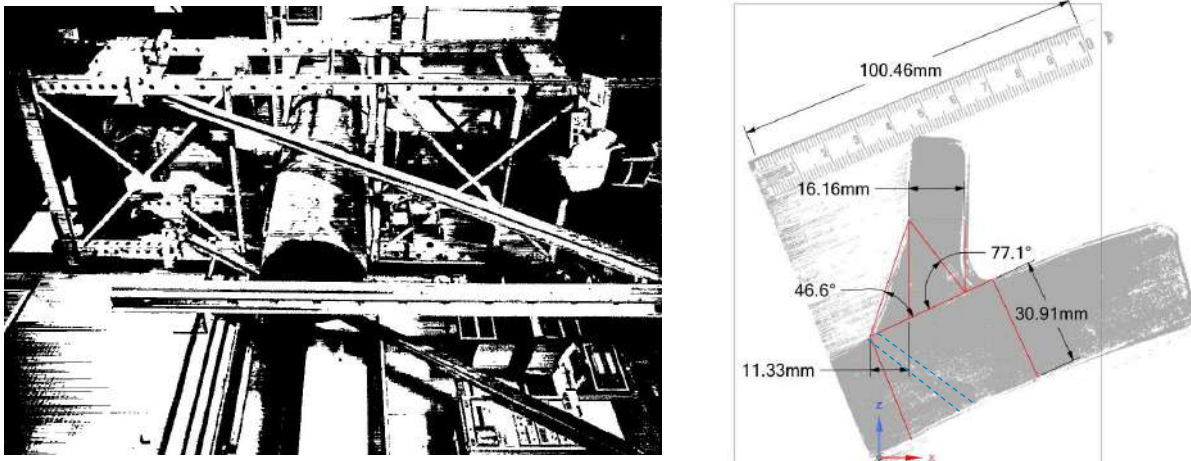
Fatigue test X-joint Dijkstra et al. (left) and failed saddle with weld dimensions δ and l_e sketched (right)
